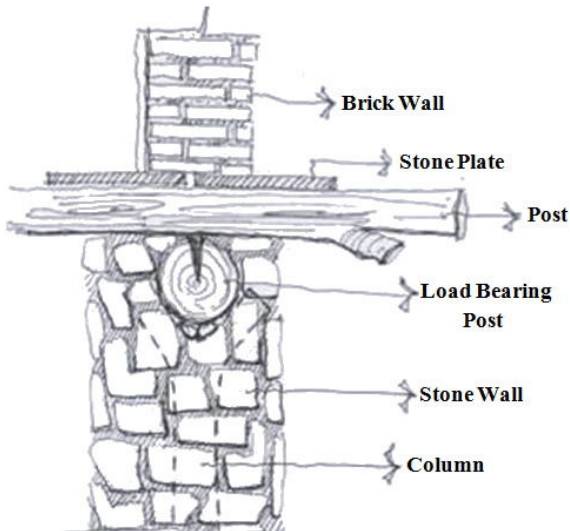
Connection details of brick wall to stone wall in Ushtobin Village Houses
